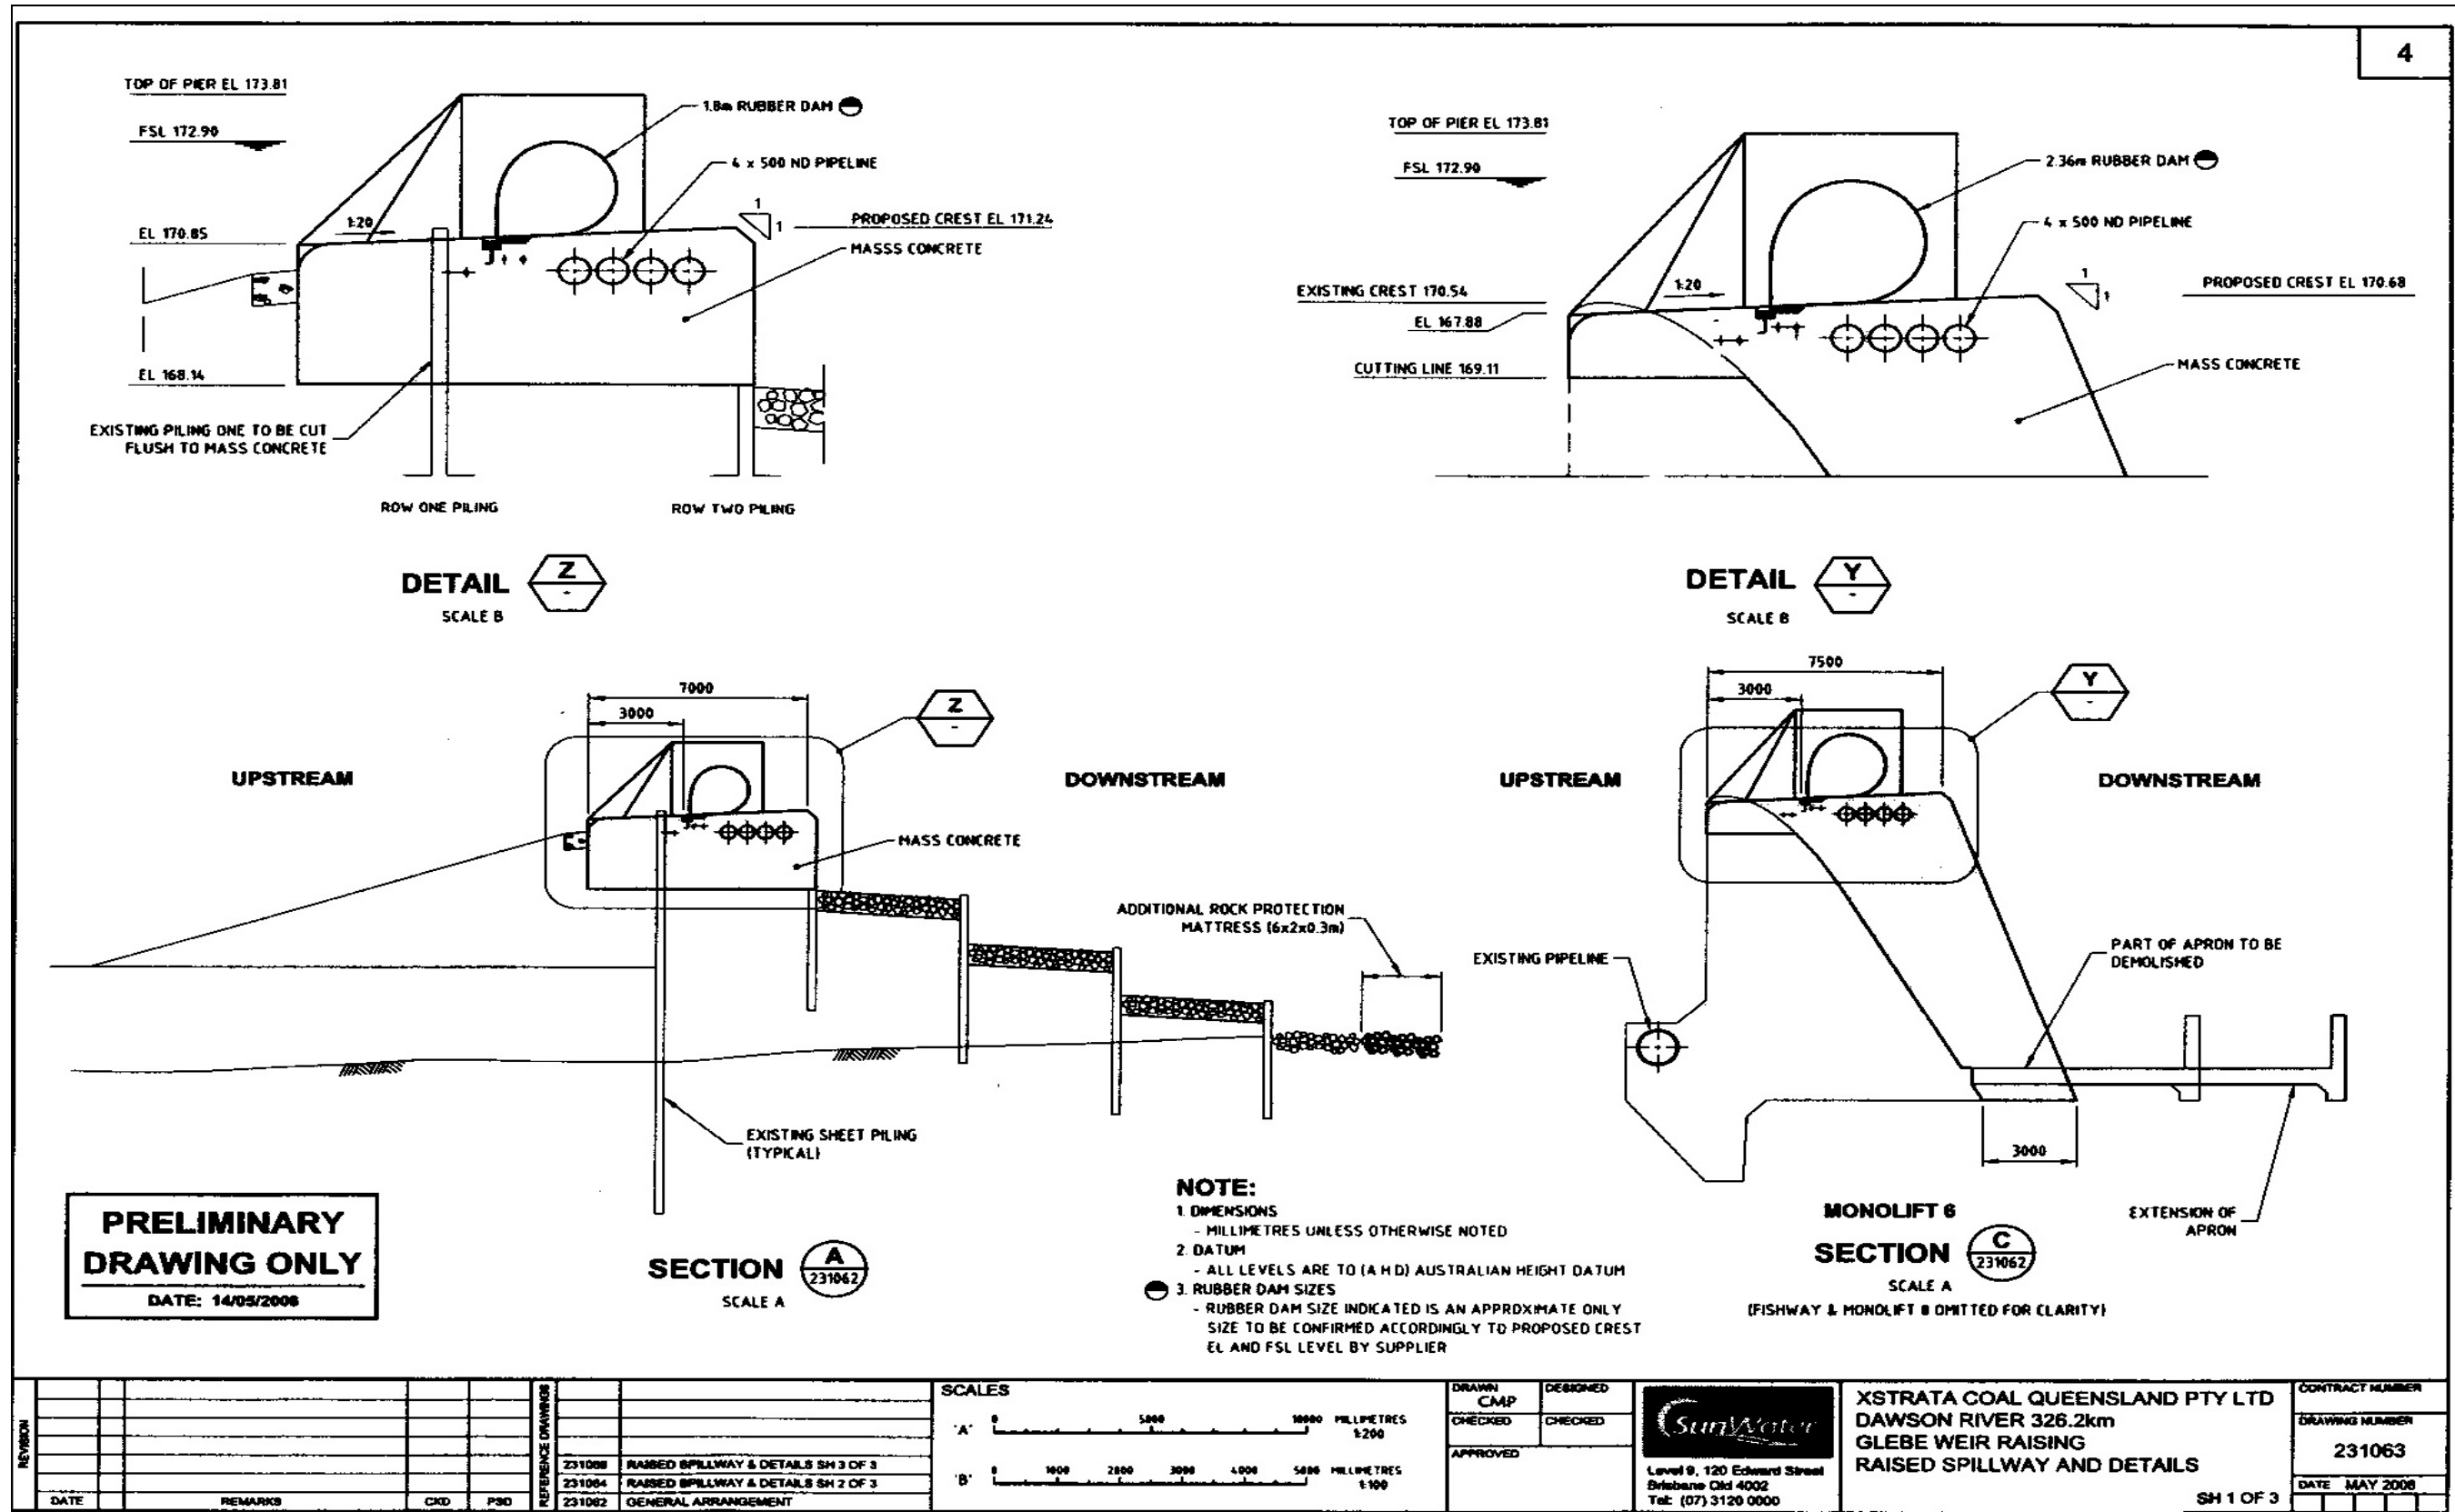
Sections through abutments and spillway showing proposed modifications to Glebe Weir.
